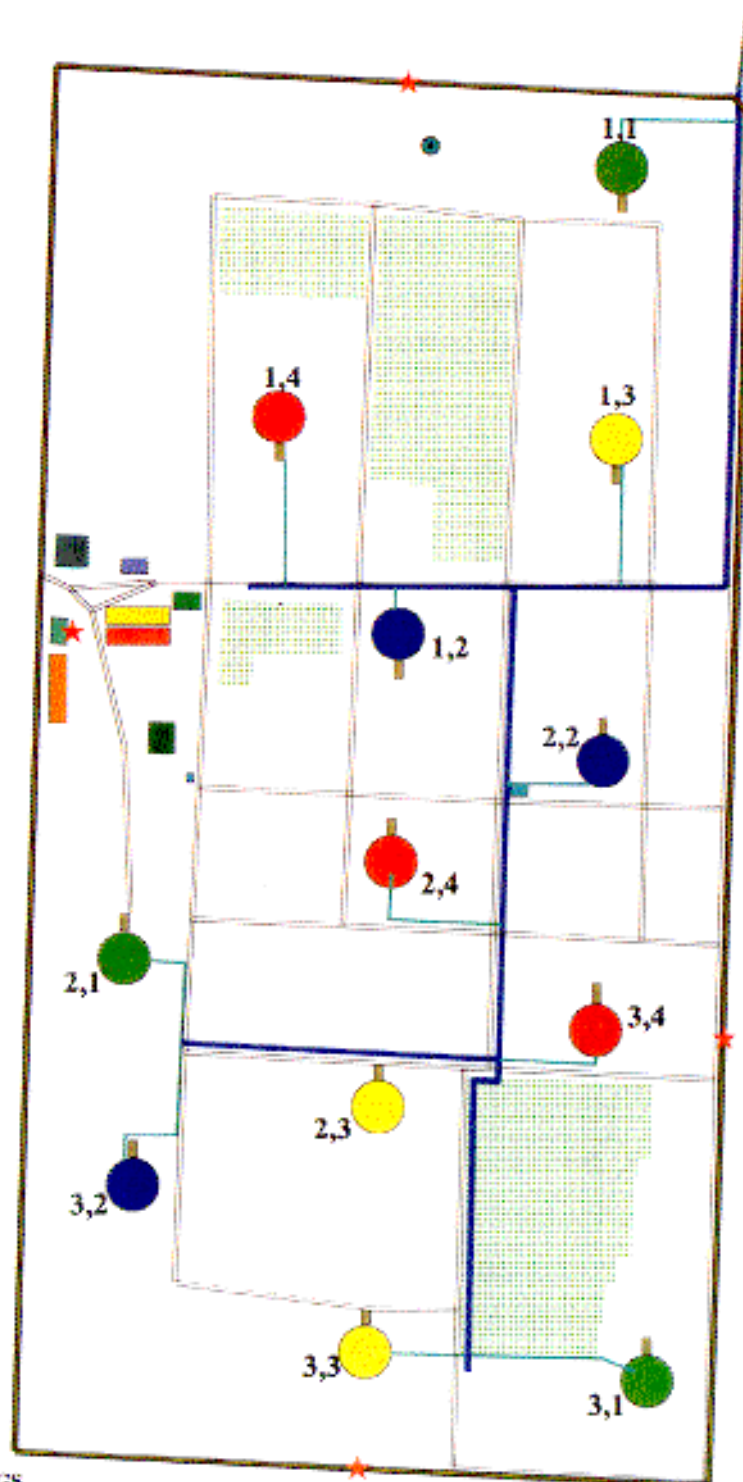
Aspen FACE site layout—Underground electrical cable.
